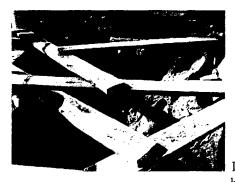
Sink hole in front of retaining wall prior to fire hydrant repair.
